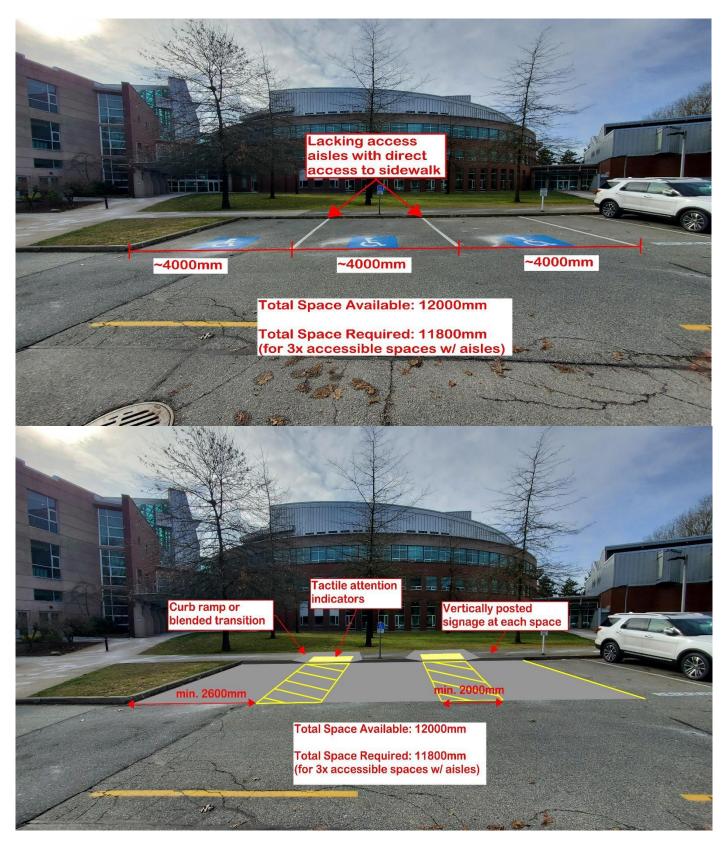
Potential parking re-configuration with accessible dimensions
